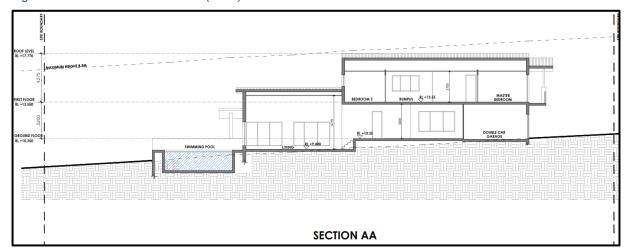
Typical Section plan of new dwelling house and in-ground swimming pool
